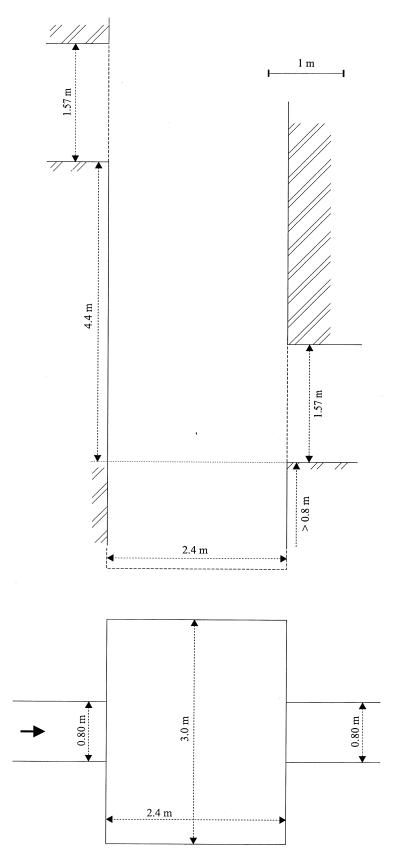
Dimensioned drawings of dropshafts. Brisecou Forest, Montjeu aqueduct.
